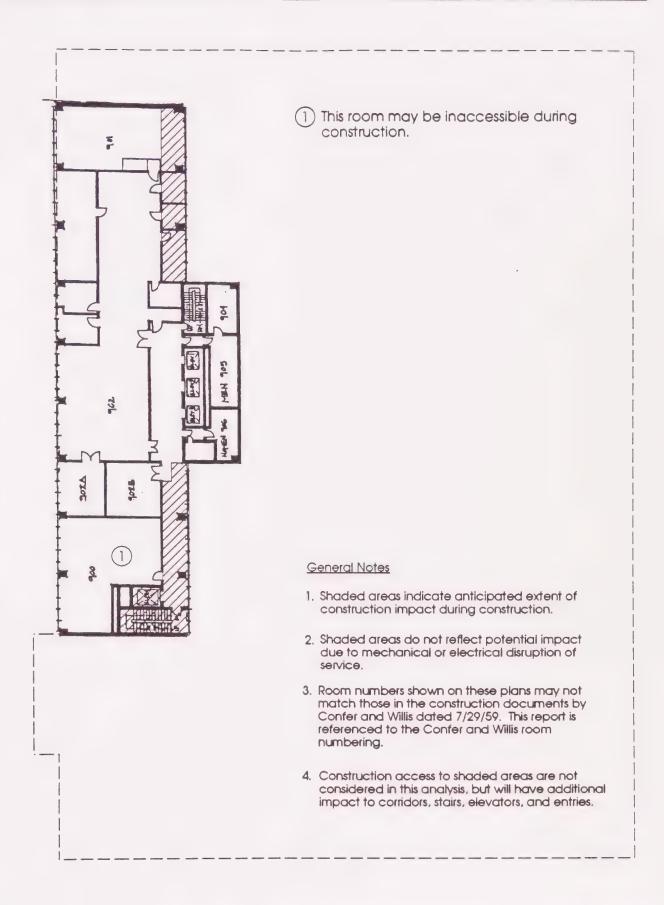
9th Floor Plan Showing Areas Impacted by Construction
